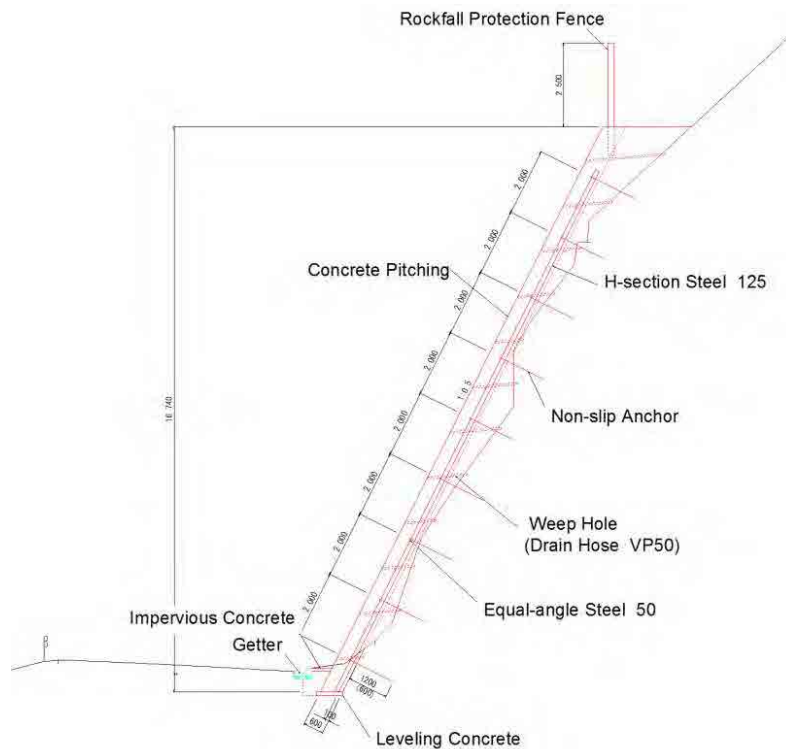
EXAMPLE OF CONCRETE PITCHING
